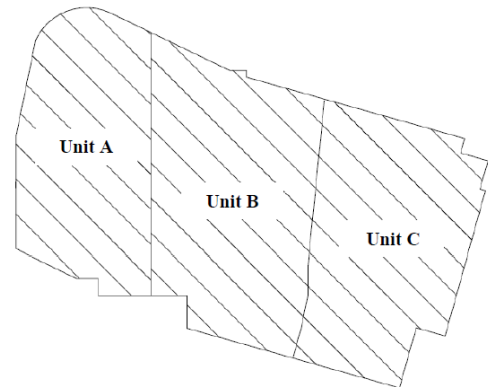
Plan view of the Six Towers complex showing the three dynamically independent building units.
